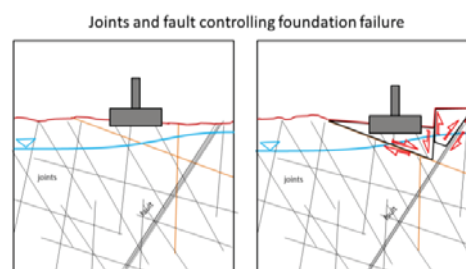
Foundation failure controlled by joints and a fault.
